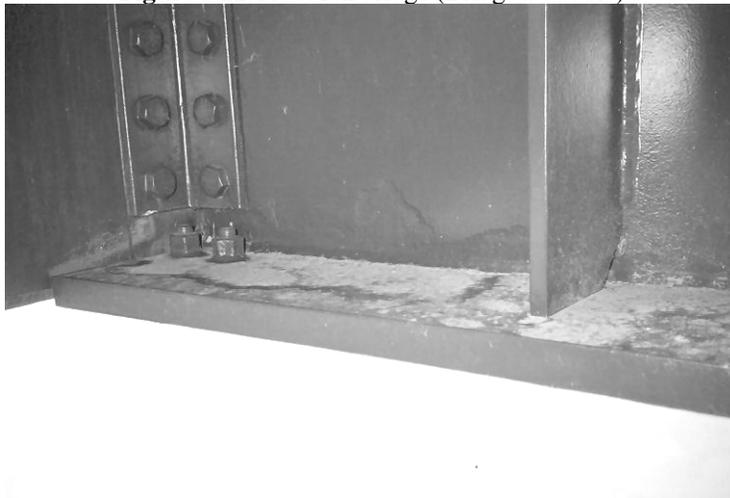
Tied arch floor beam (Bridge # 9600S)
